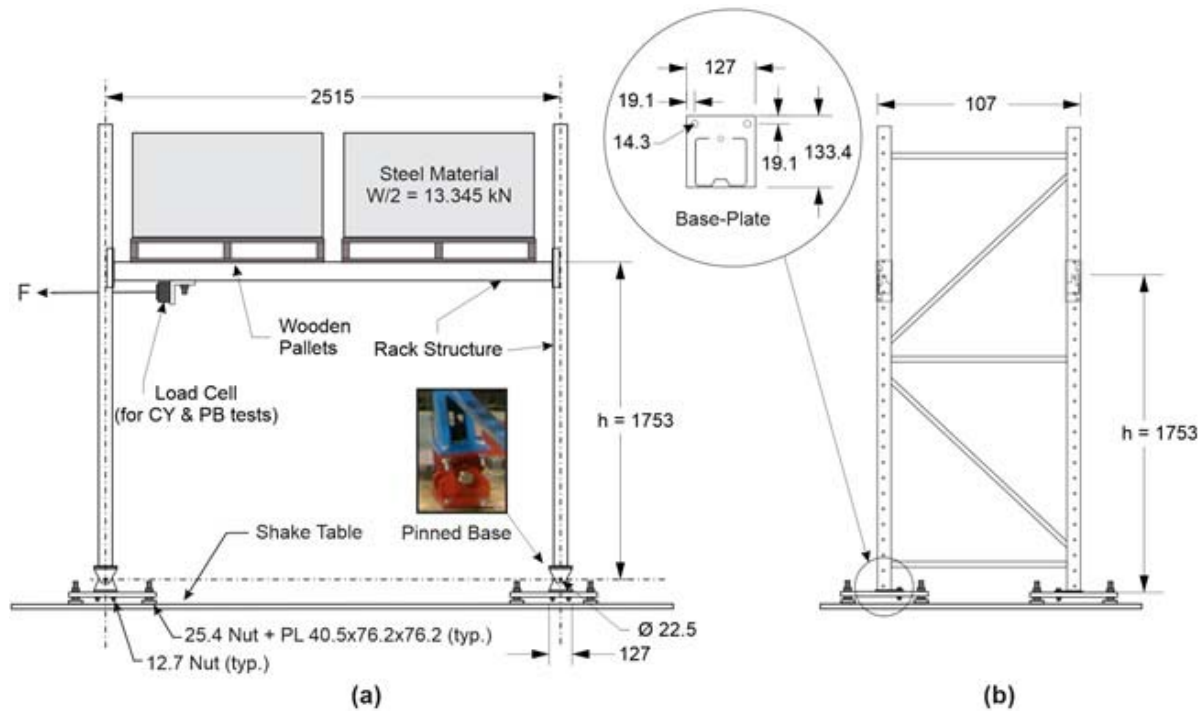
Test setup (all dimensions in mm): a) Elevation view; b) Side view.
